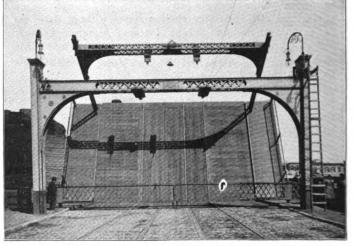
shows a view of the roadway of the new Scherzer rolling lift bridge at Third street, the bridge carrying the clear width of street across the canal and avoiding any obstructions above the surface of the street. The great improvement for highway traffic over the bridge is clearly illustrated in this comparison between the roadways of the old and new bridges illustrated in Figs. 5 and 6.
